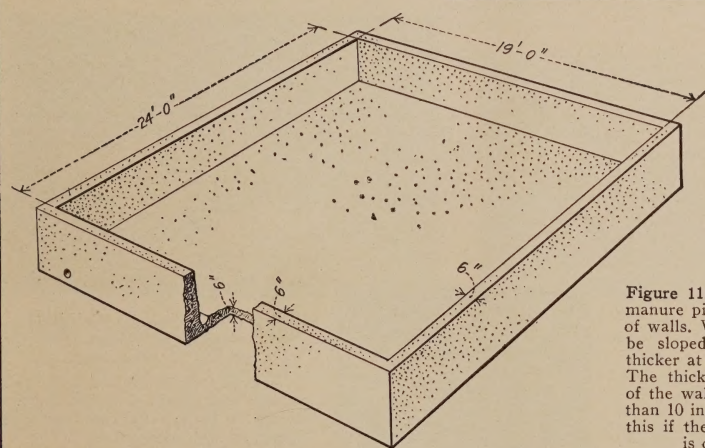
A drawing of manure pit showing thickness of walls. Walls should always be sloped so that they are thicker at bottom than at top. The thickness at the bottom of the wall should not be less than 10 inches, and more than this if the height of the wall is over $3\frac{1}{2}$ feet.
